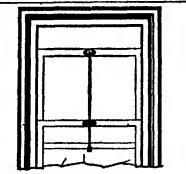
A. B. Barnes' sliding plane, showing a mechanical device with a sliding component and a support structure.
